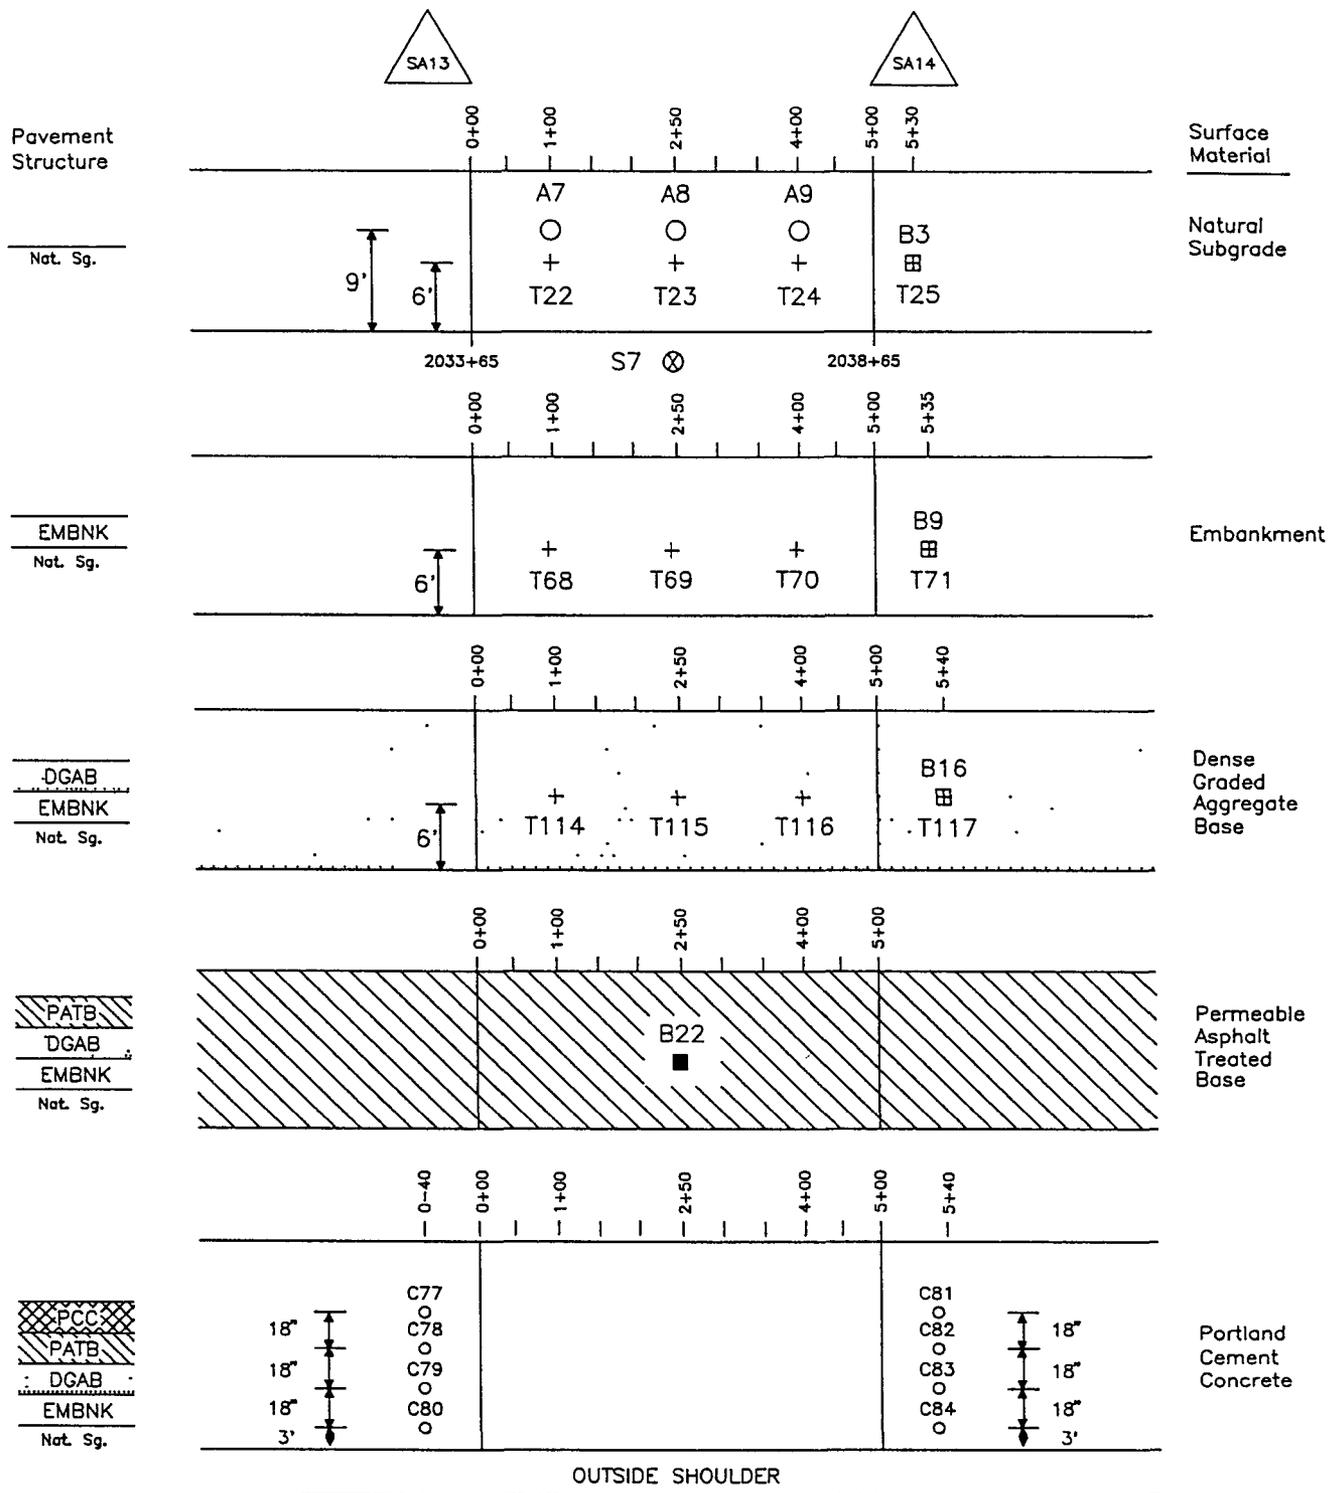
Sampling and test plan for test section 530209, SPS-2 Washington
